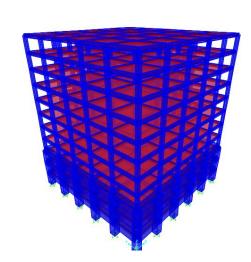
Model 8 - Building with floating column at second floor (3D View)
